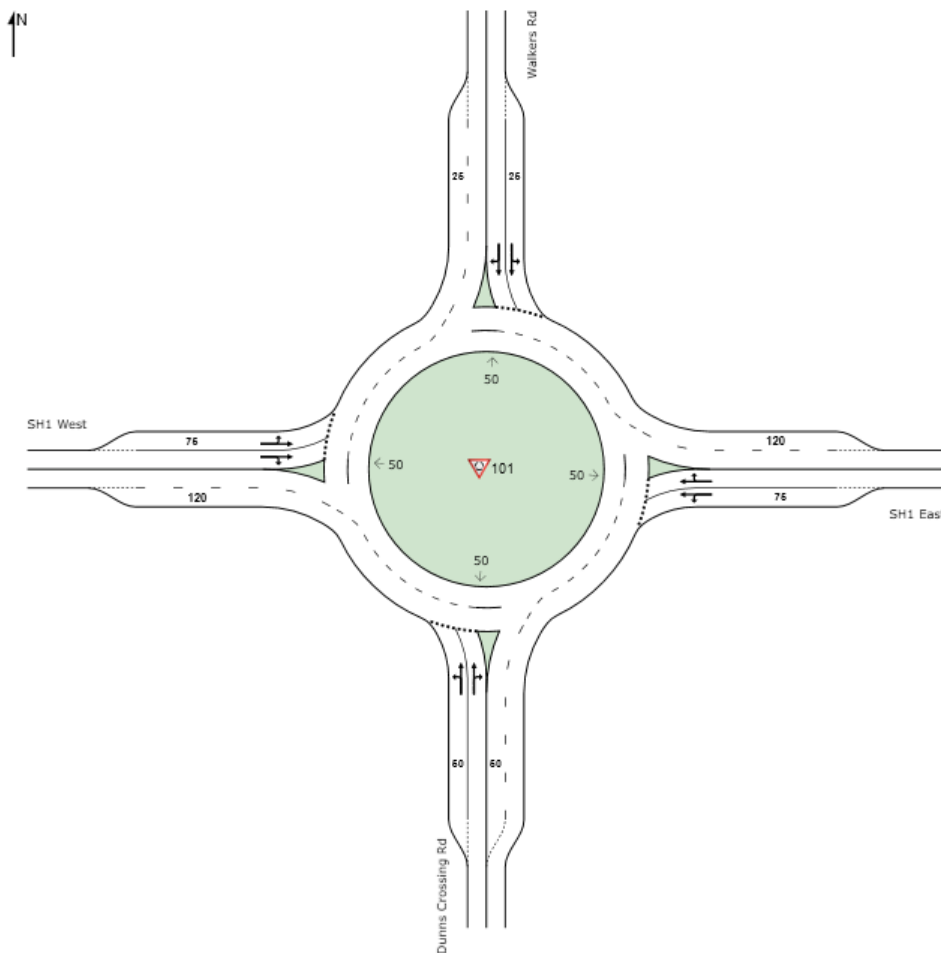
SH1 / Dunns Crossing Road / Walkers Road Assumed Layout
